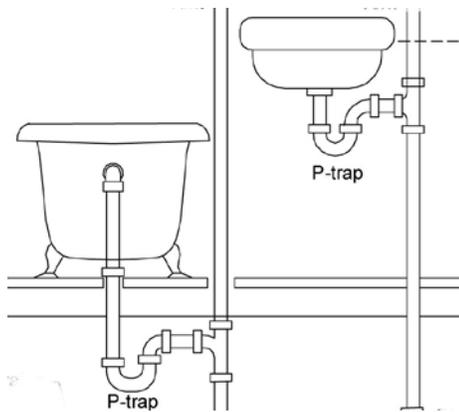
Typical "p-trap" under a bathtub, shower or sink.
